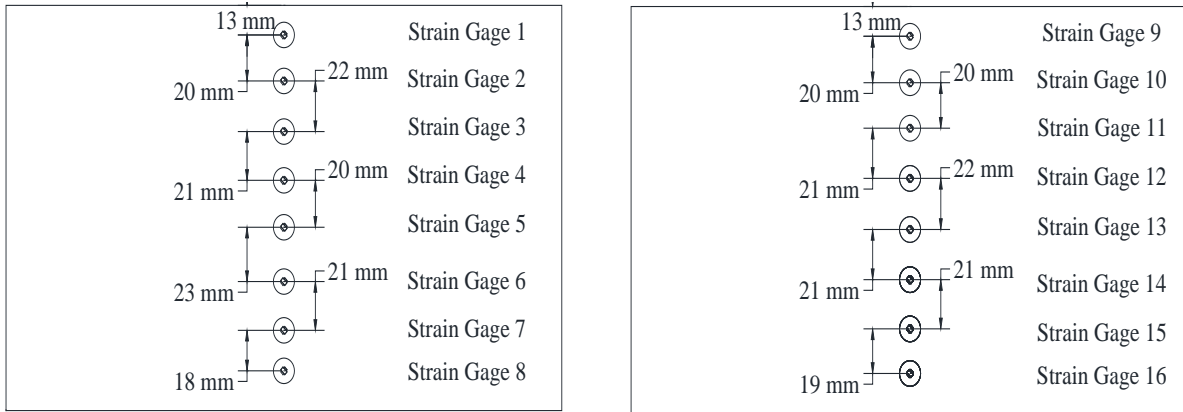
Strain gage layout in Test 4A-R2 (inner side of wall).
